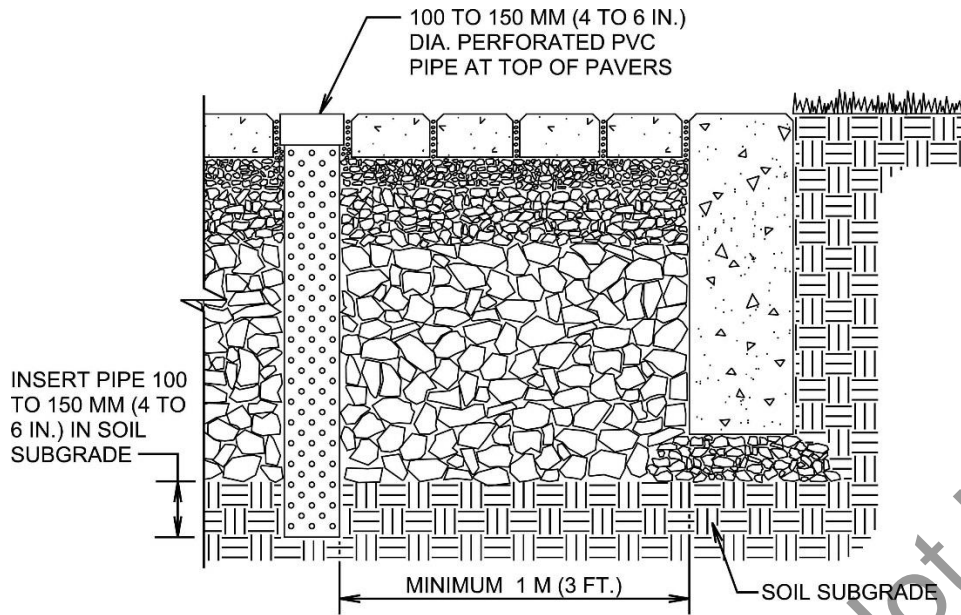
Observation Well in PICP at the Lowest Subgrade Elevation
